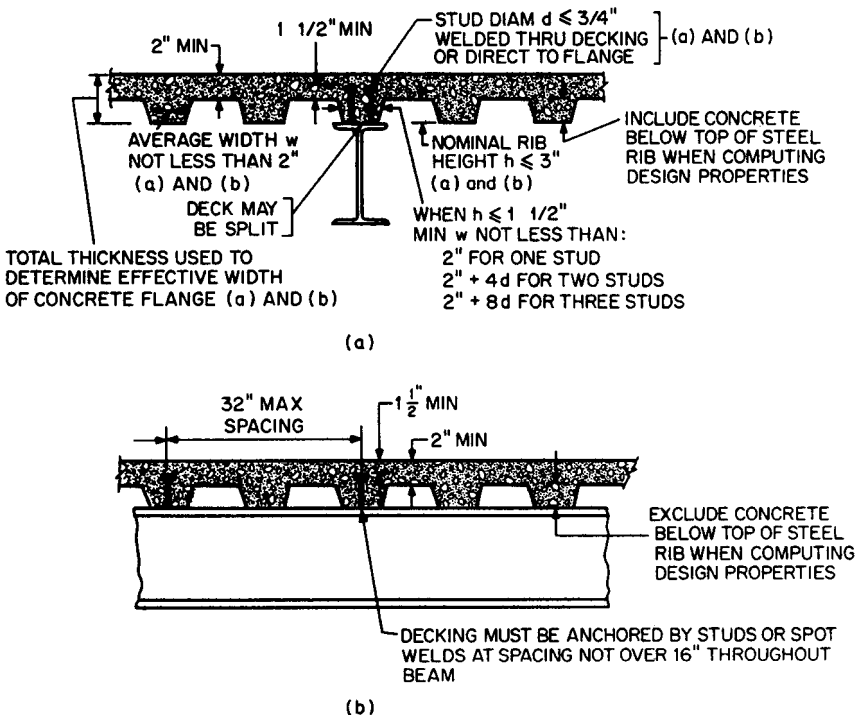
Steel-concrete composite-beam construction with formed steel decking: (a) ribs parallel to beam; (b) ribs transverse to beam [refer to (a) for applicable requirements].
